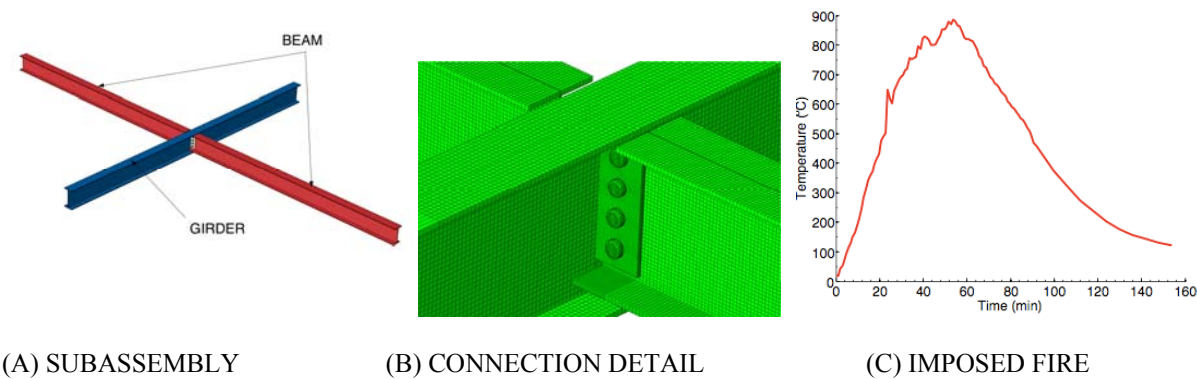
FINITE ELEMENT MODEL OF FLOOR SUBASSEMBLY AND IMPOSED FIRE.
